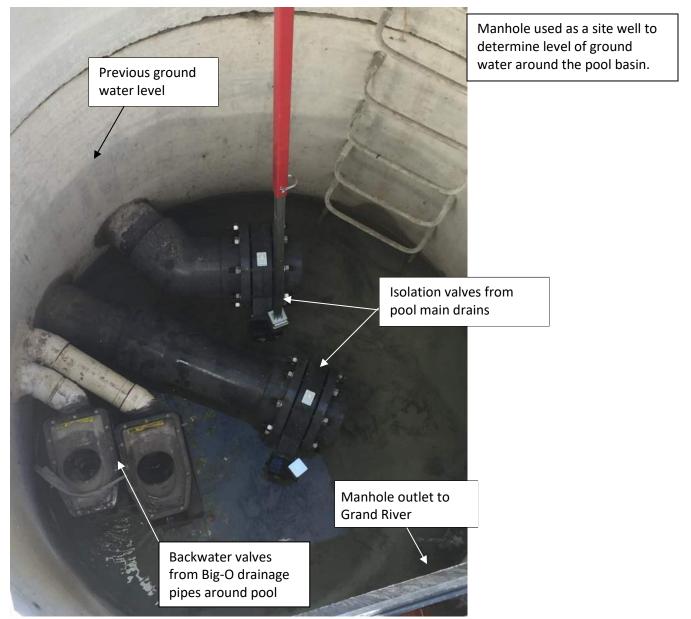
Kiwanis Park, Kitchener manhole drainage system.
